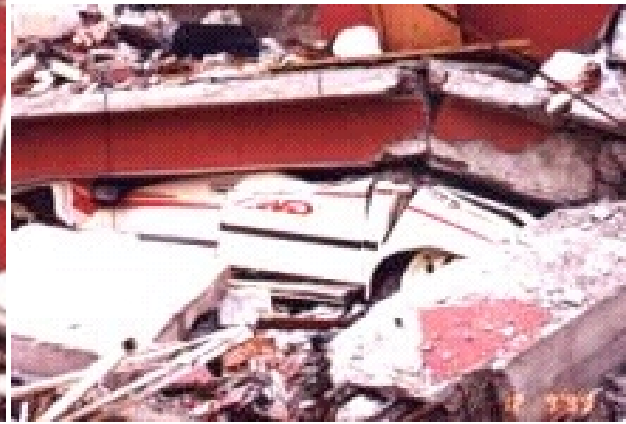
b: bottom right detail of fig 5.19a), showing failure of the beam
